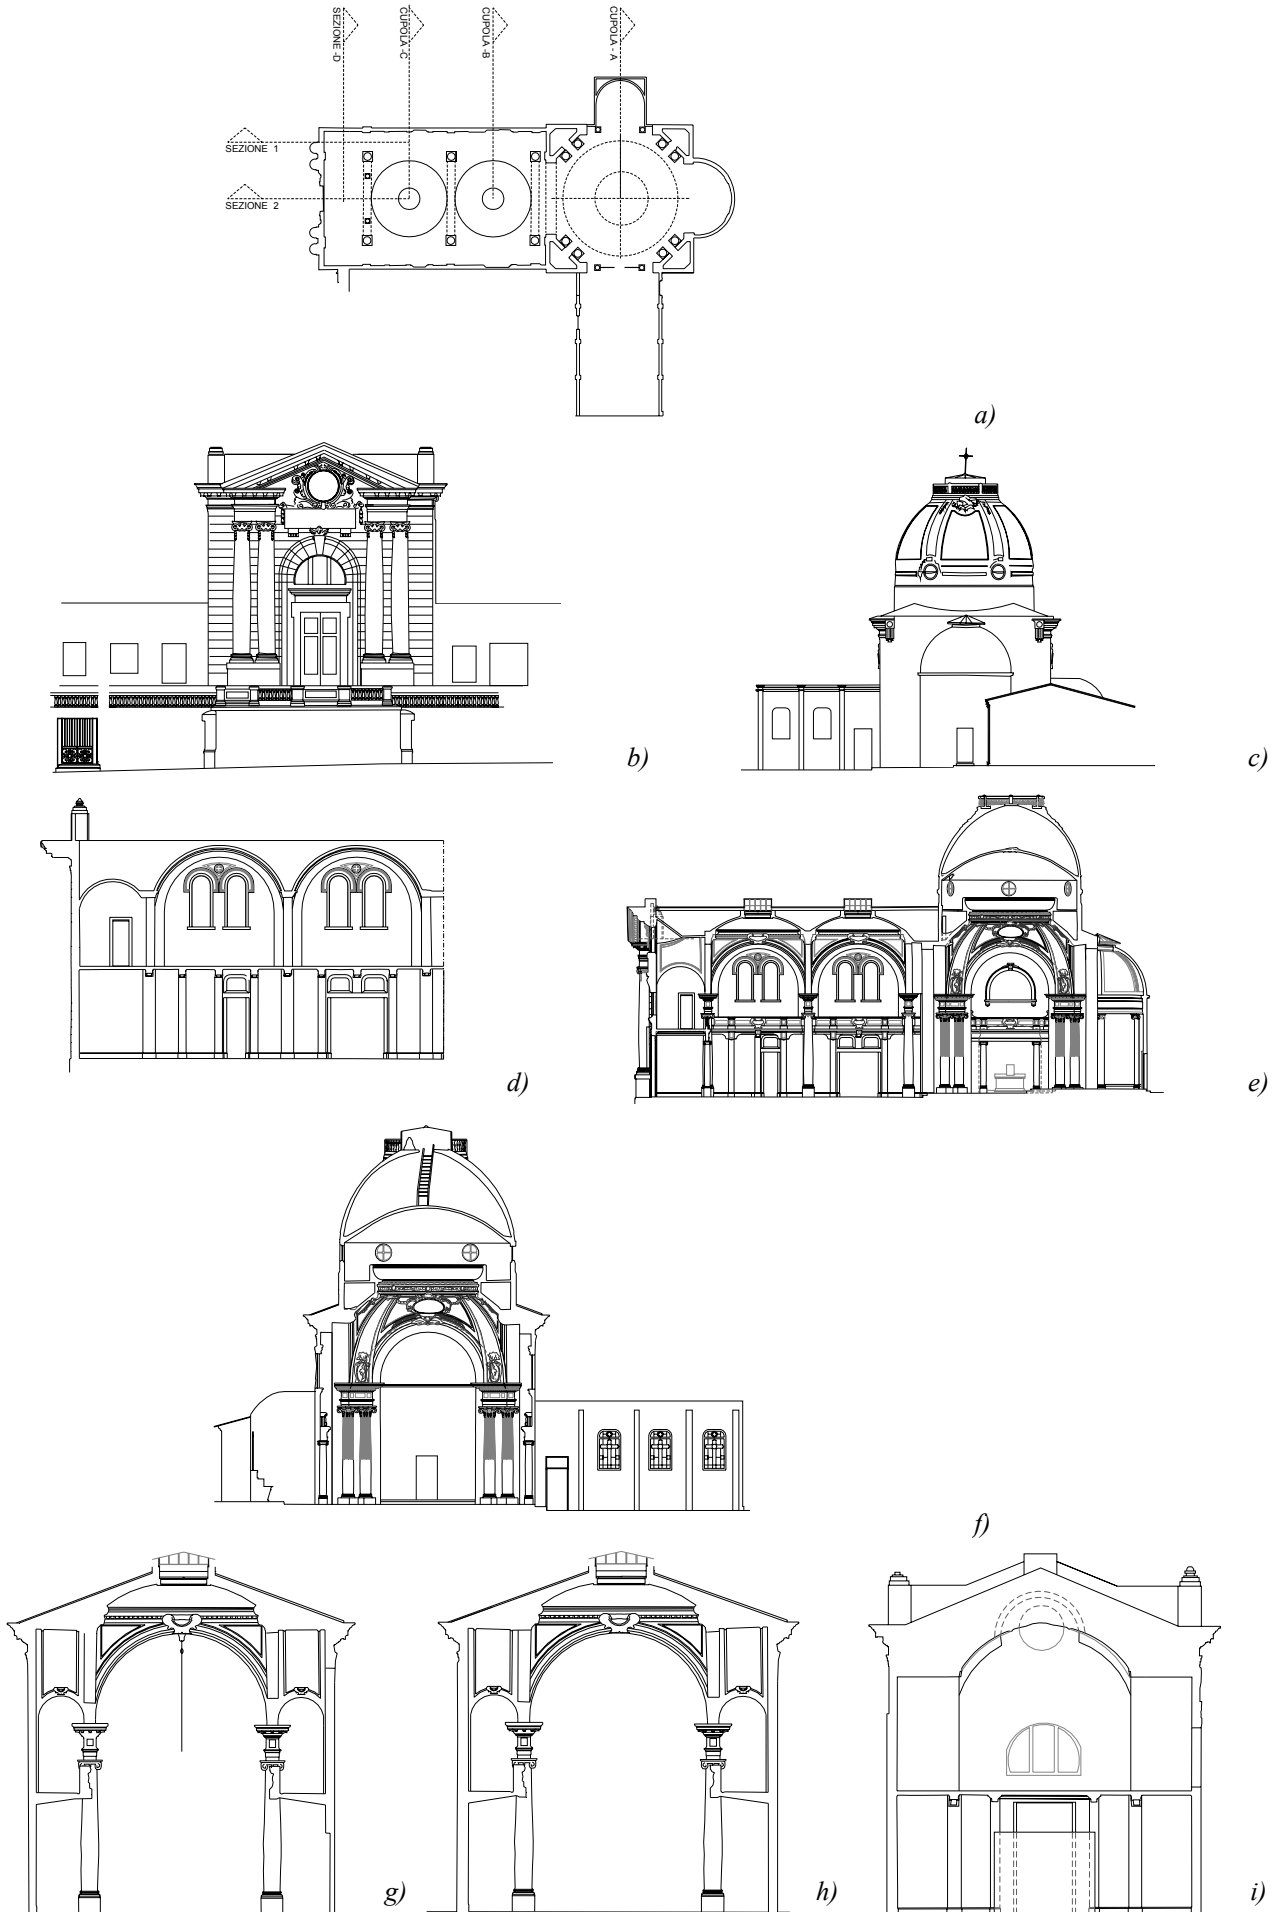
Plan, front and section drawings of the Las Hermanas de la Providencia Church: a) plan; b) North front; c) South front; d) section 1; e) section 2; f) section A; g) section B; h) section C; i) section D.
